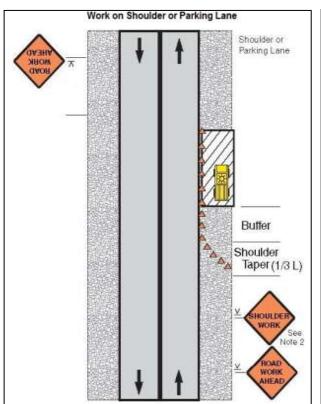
to Figure A5 illustrates a typical set-up for installing traffic control devices at the work zone of the area, depending on the location of work on the road way, and road geometrics:
